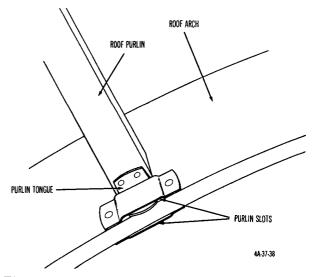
Installing roof purlins in tent frame-type, insulated, sectional.
